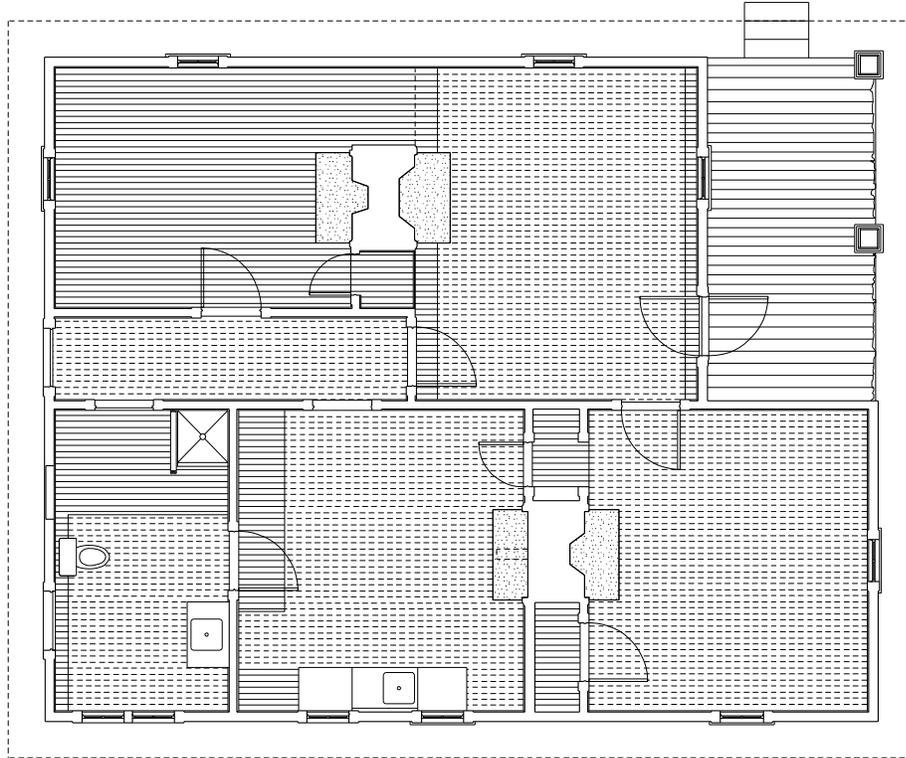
Floor plan of 9791 State Route 124 – Façade/Front Facing to the Left
